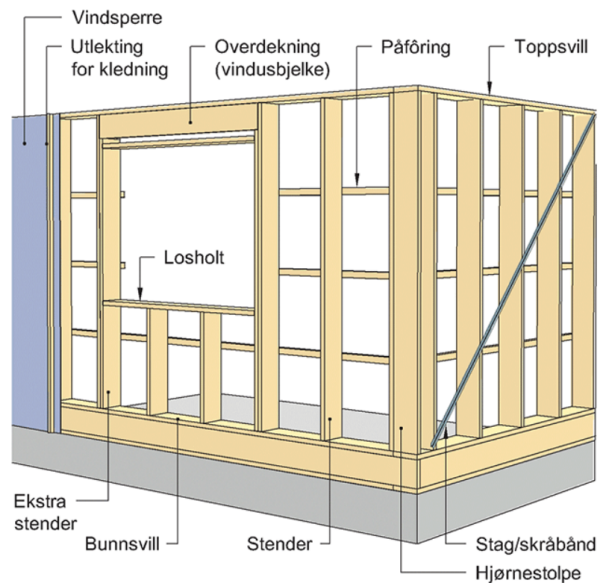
Illustration of a wooden framing structure for external walls(Byggforsk, 2014).
